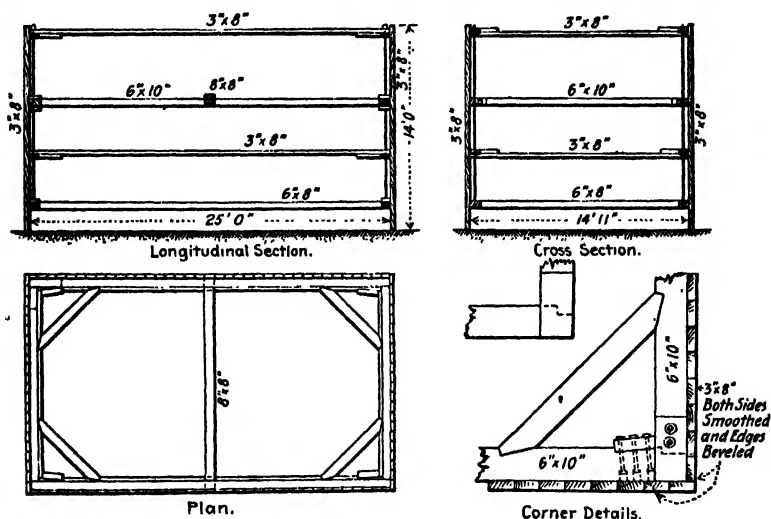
Cofferdam Used on Key West Extension of Florida East Coast Railway.
